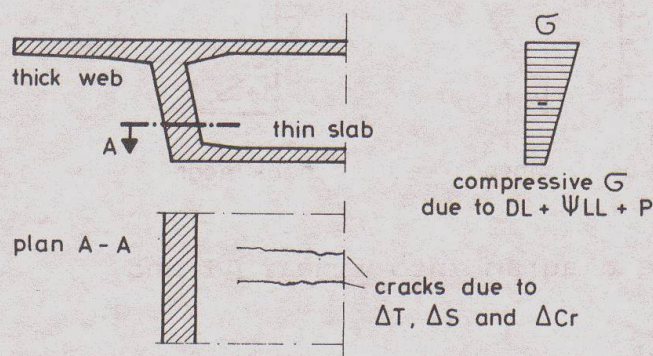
Transverse cracks in thin bottom slab due to ΔS , ΔCr , ΔT in spite of high prestressing
